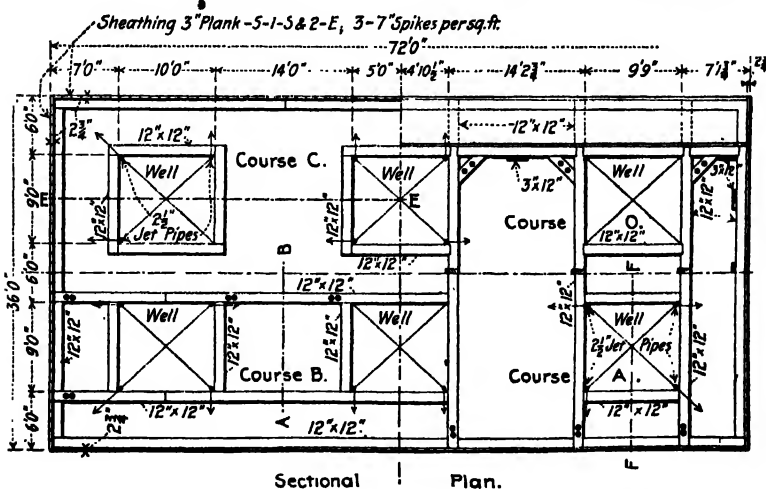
b* and *c* show the details of construction for the 36-by 72-foot open caisson of the Willamette River bridge, of the Oregon-Washington Railroad and Navigation Company. There were six wells, each 9 by 10 feet in the clear, flaring out at the bottom to occupy the whole area of the caisson. The walls of the wells and the outside walls of the caisson were made of a single thickness of 12- by 12-inch timbers laid close, the latter being sheathed on the outside with 3-inch material. As shown in the plan, certain timbers of the well walls were extended the entire length and breadth of the caisson to brace the same.
